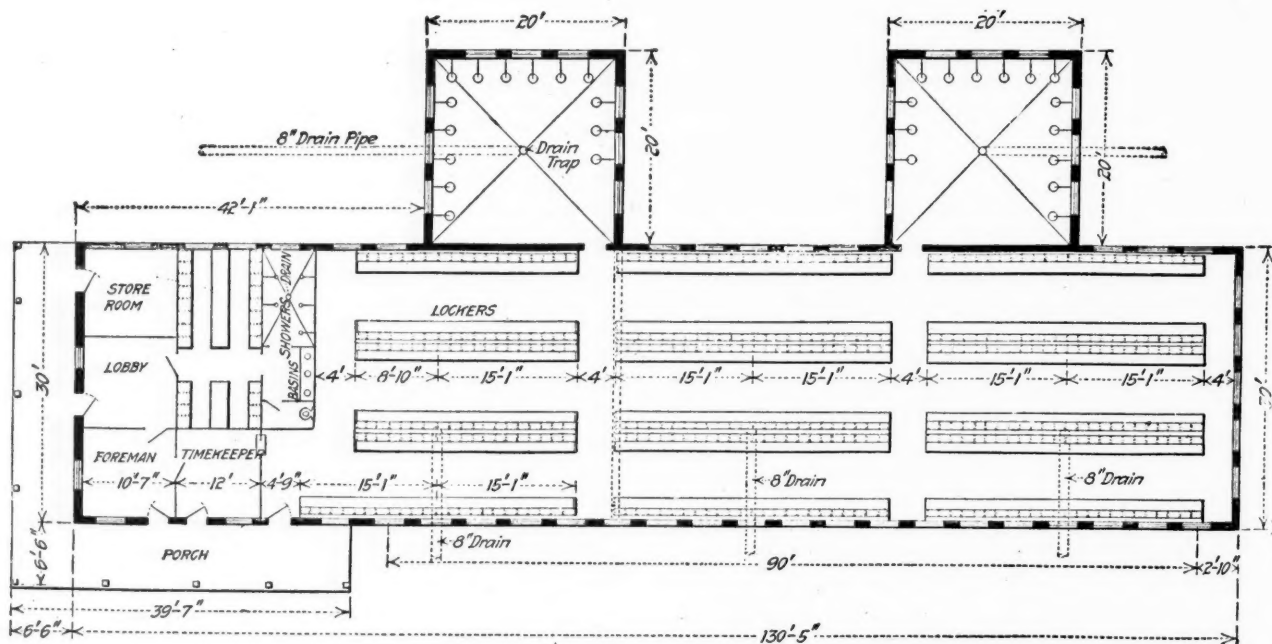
FLOOR PLAN OF THE COPPER QUEEN WASHHOUSE
